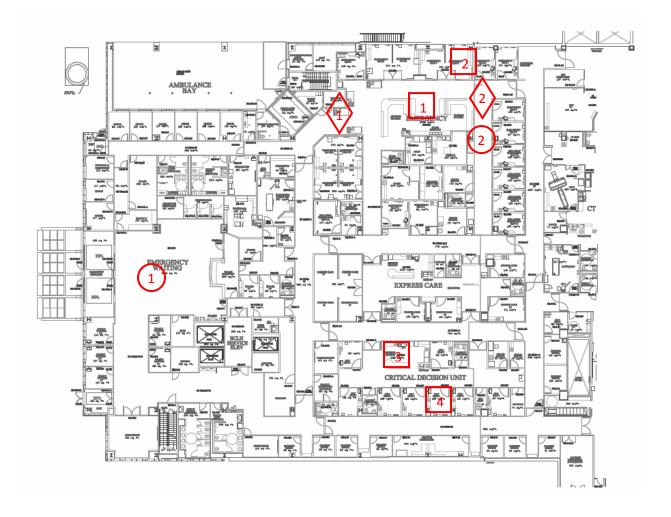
Floor Plan and Measurement Locations for Hospital 1
